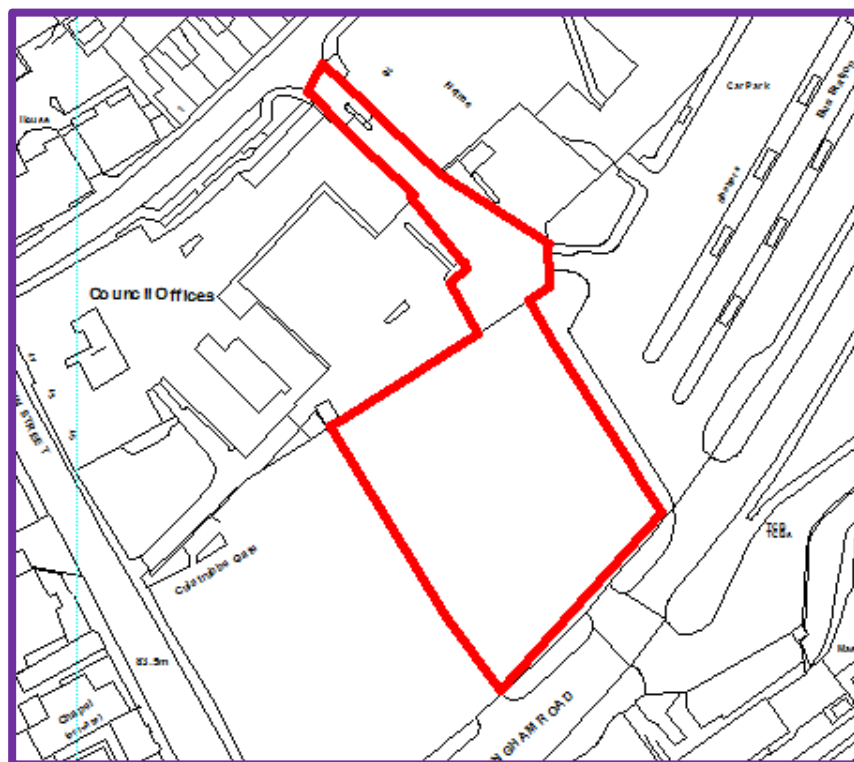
Site Location Plan outlining the land to be developed as part of this planning application.
